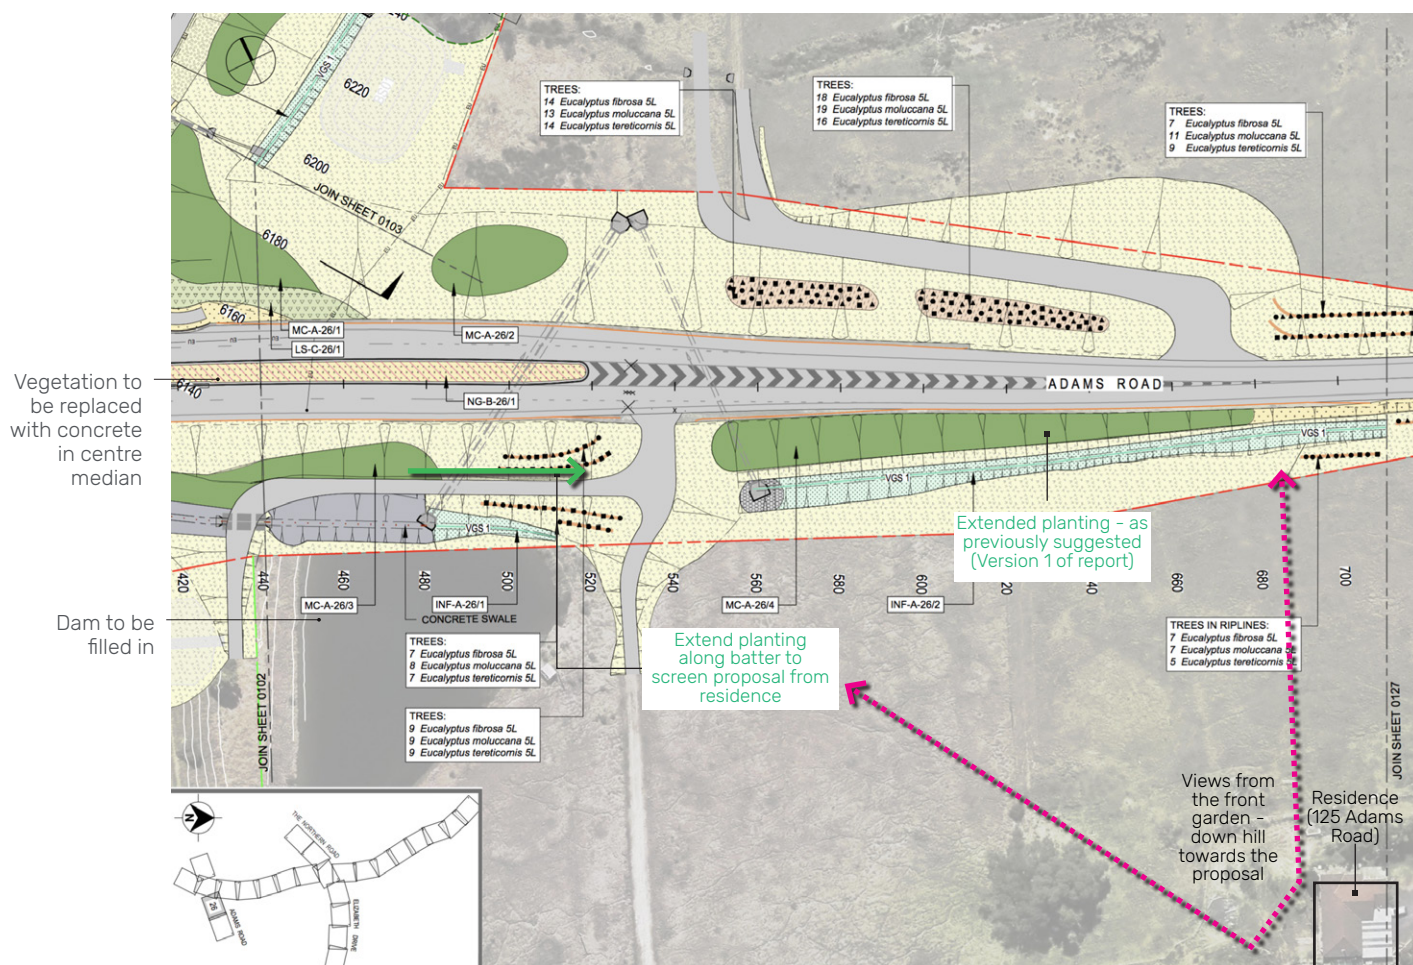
Landscape plan (100% design - LA-0126) for Adams Road east of the intersection with The Northern Road (Source: Ki Studios)
